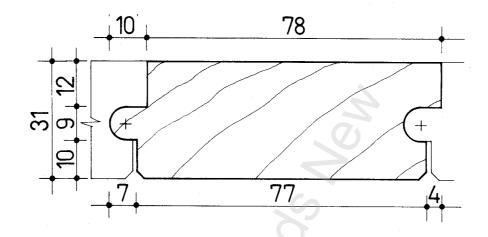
100 mm x 40 mm TONGUE AND GROOVE SECRET NAIL FLOORING (full size)
